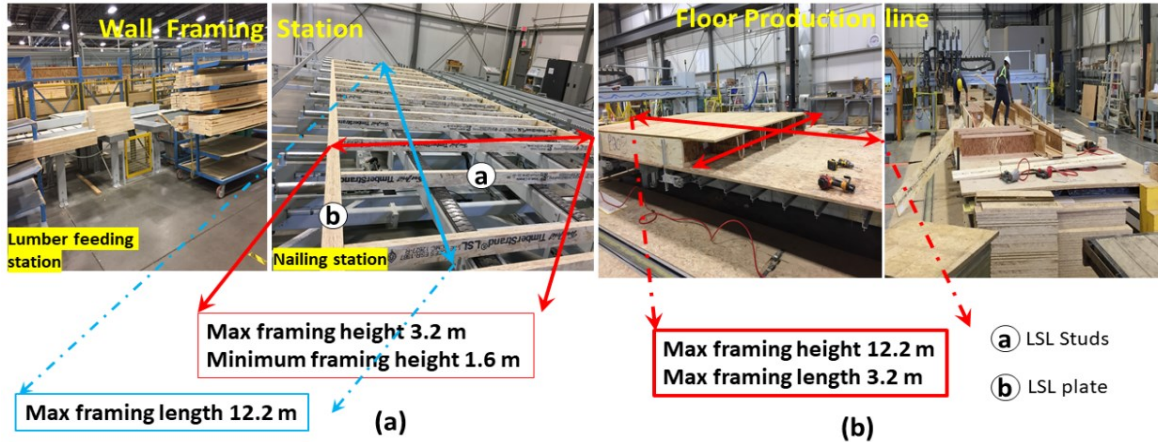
Production facility constraints (a) Wall framing station (b) Floor production line (source: ACQBUILT Inc. 2019).
